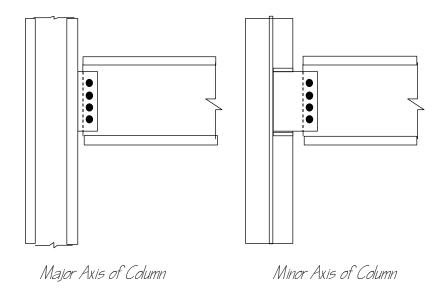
Typical Simple Shear Tab Connection Without Slab
